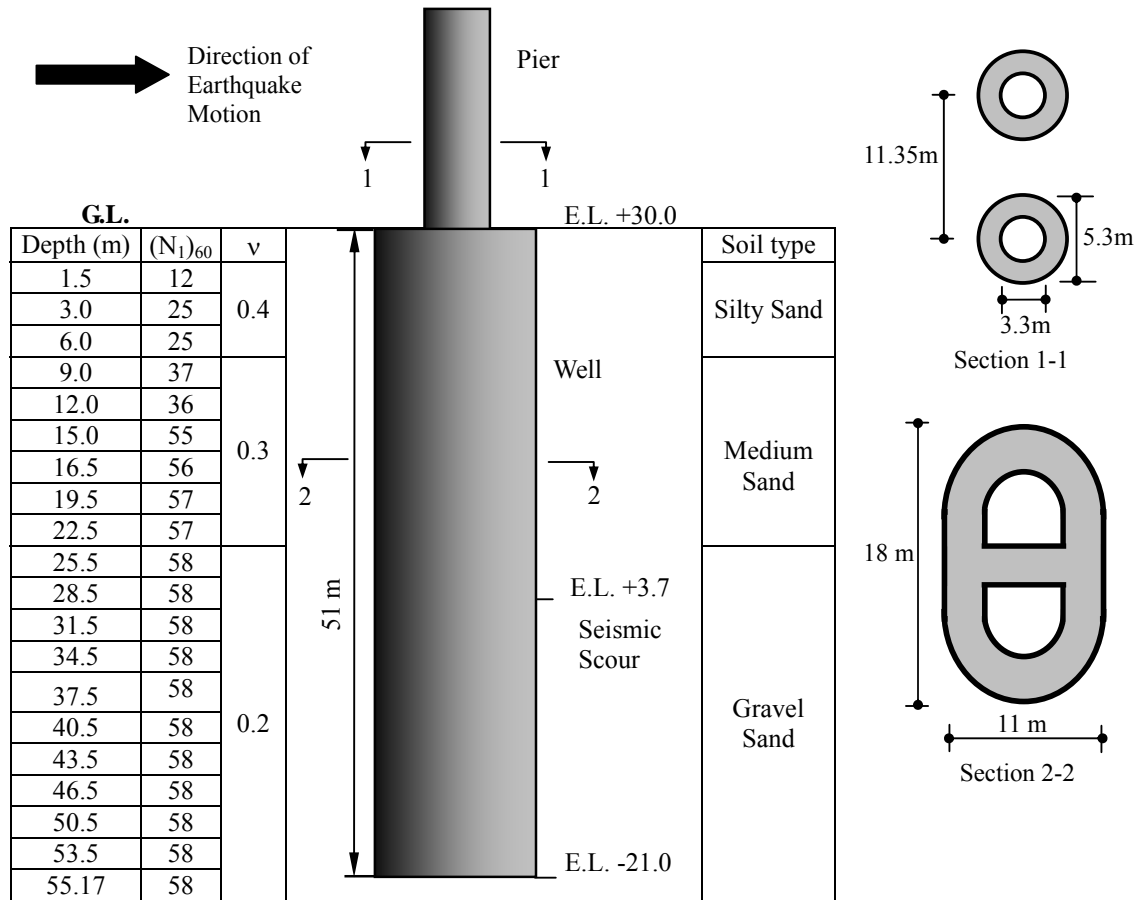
Average soil profile along bridge alignment and schematic drawing of well foundation
